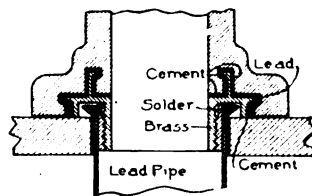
Secure Type of Floor-Joint, for Closets which can be Revolved about the Outlet.
